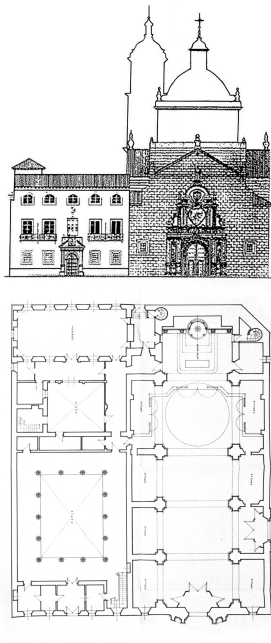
Floor plans and elevations of the church of San Justo y Pastor and the adjacent cloisters [5].
